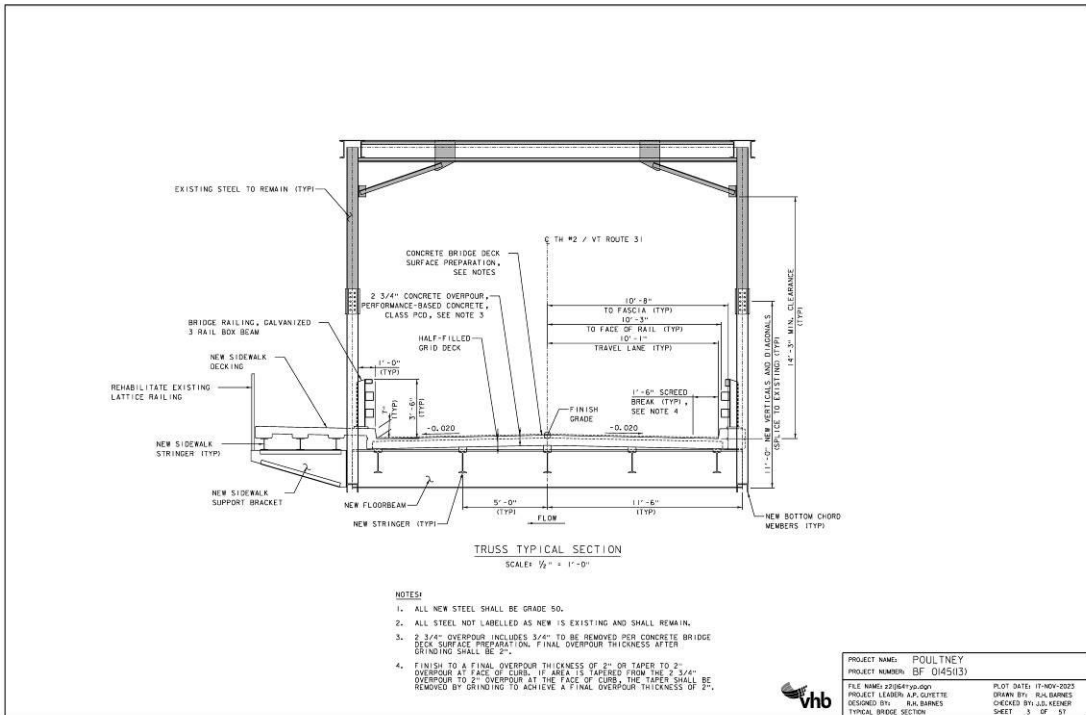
Typical Bridge Section, Sheet 3 of 57. Preliminary Plans, November 2023.
